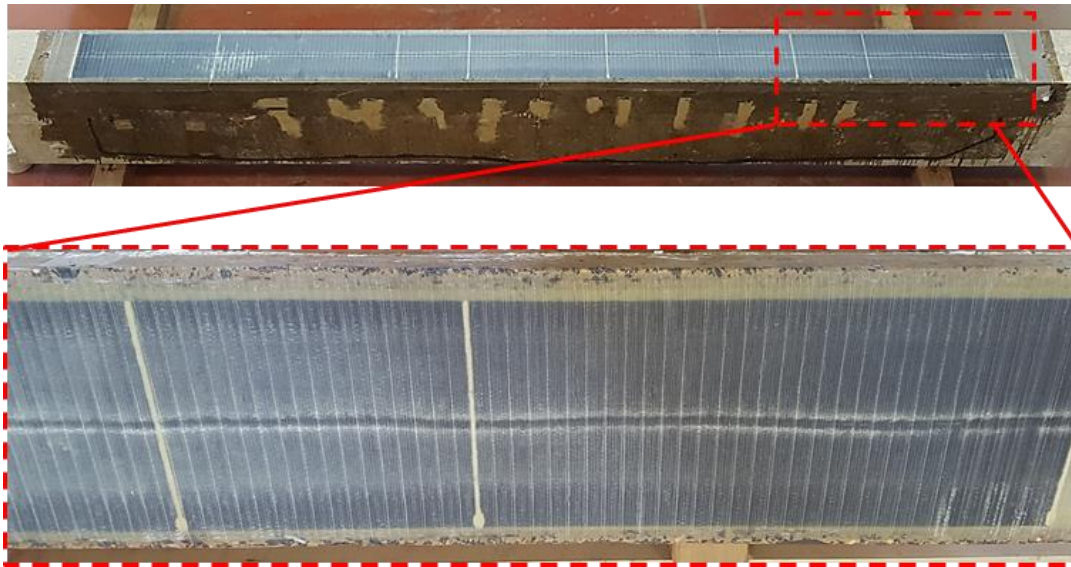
Photograph showing the finished hybrid composite specimen with a close-up view of the final composite, which is smooth and uniform in appearance, indicating the high quality.
